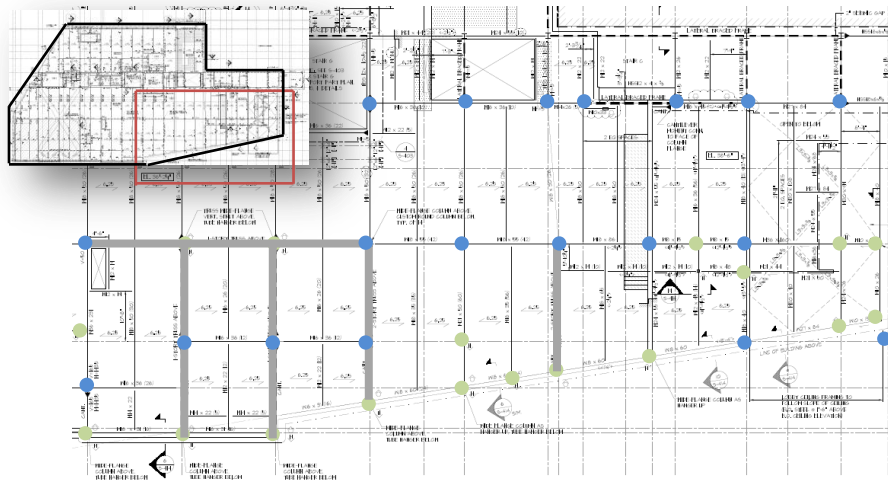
Level 3 framing plan showing hangers and outline of hung/cantilevered portion of building (S-103)
